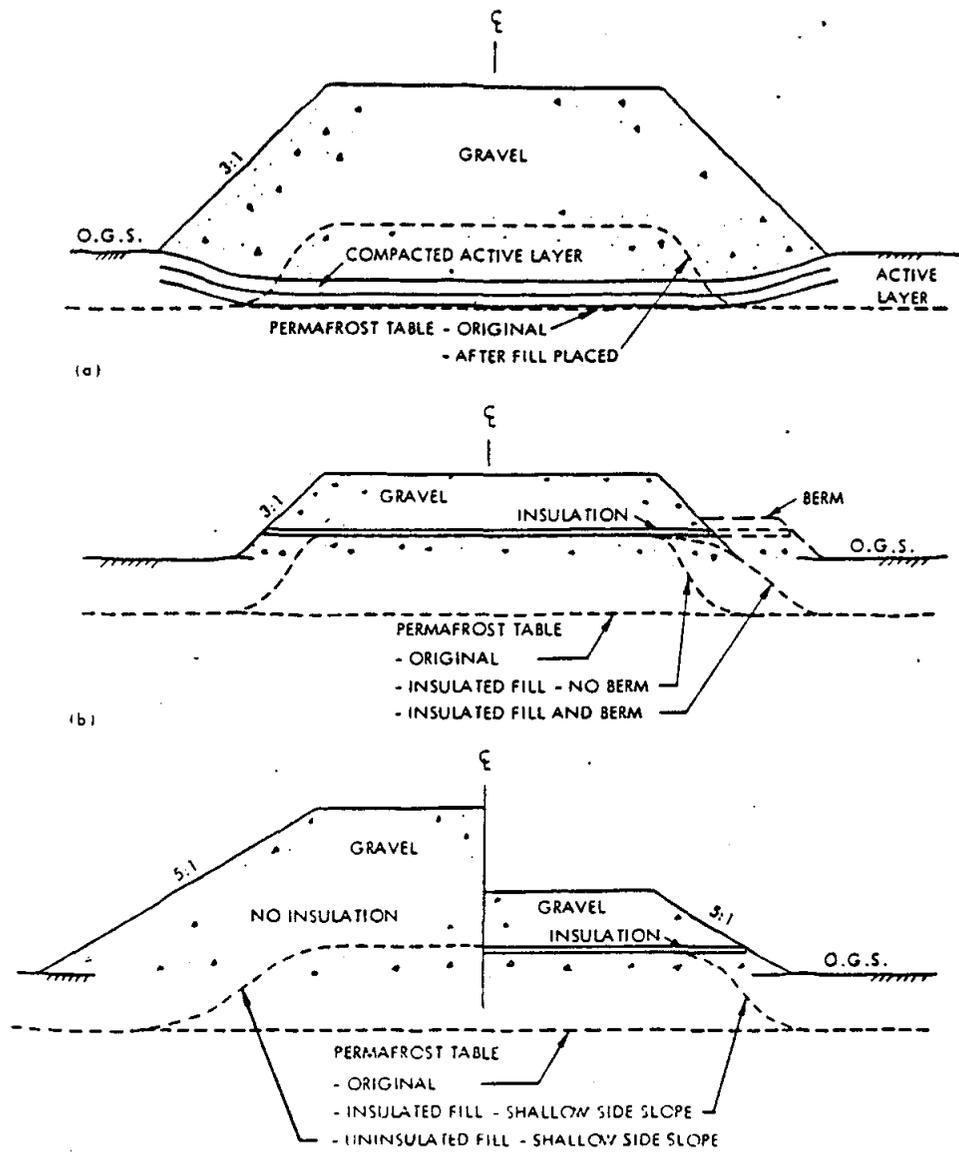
EMBANKMENT WITH OR WITHOUT INSULATION
